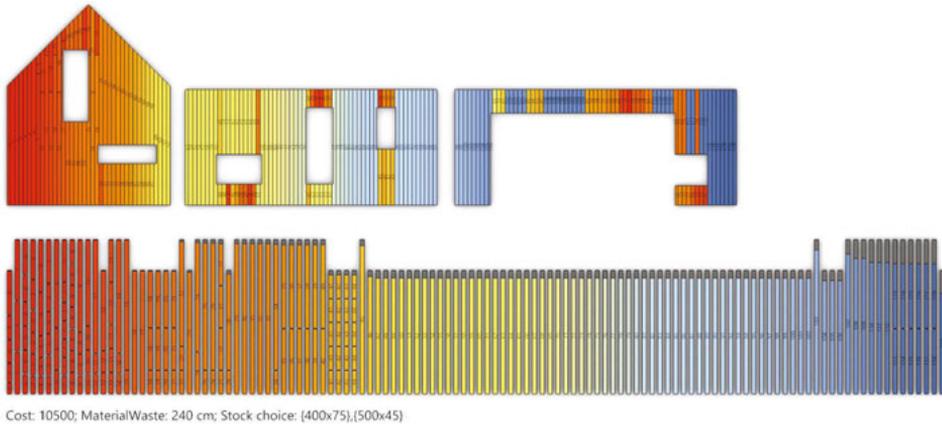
Exemplary program output. Top: façade plans with cladding. Bottom: stock material required to make the cladding. The source stock planks are numbered and colour coded
